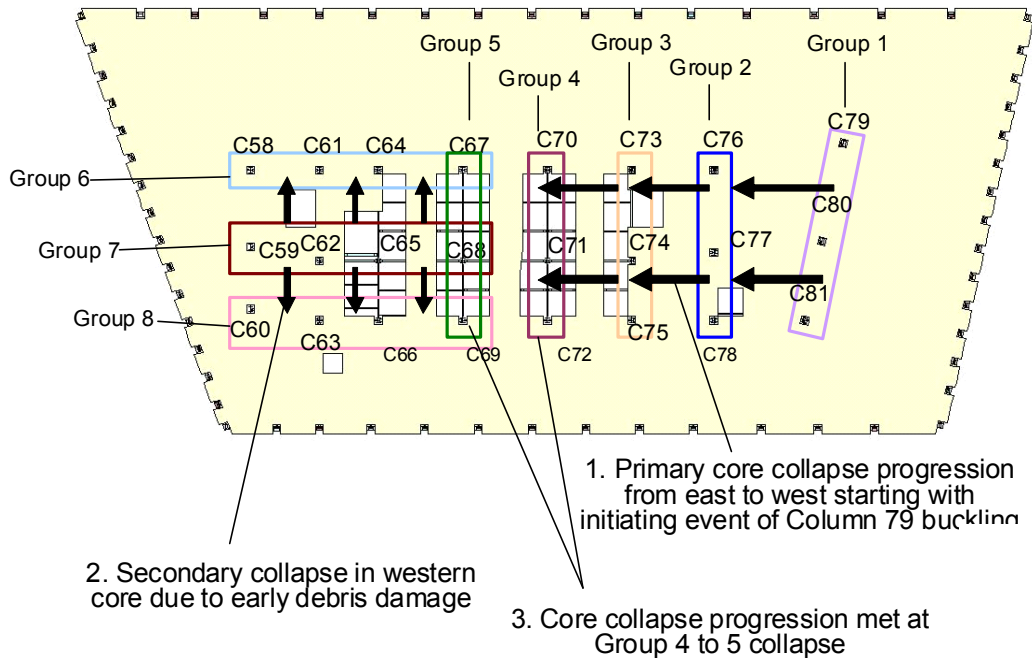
Horizontal progression of column buckling and interior column groupings.
